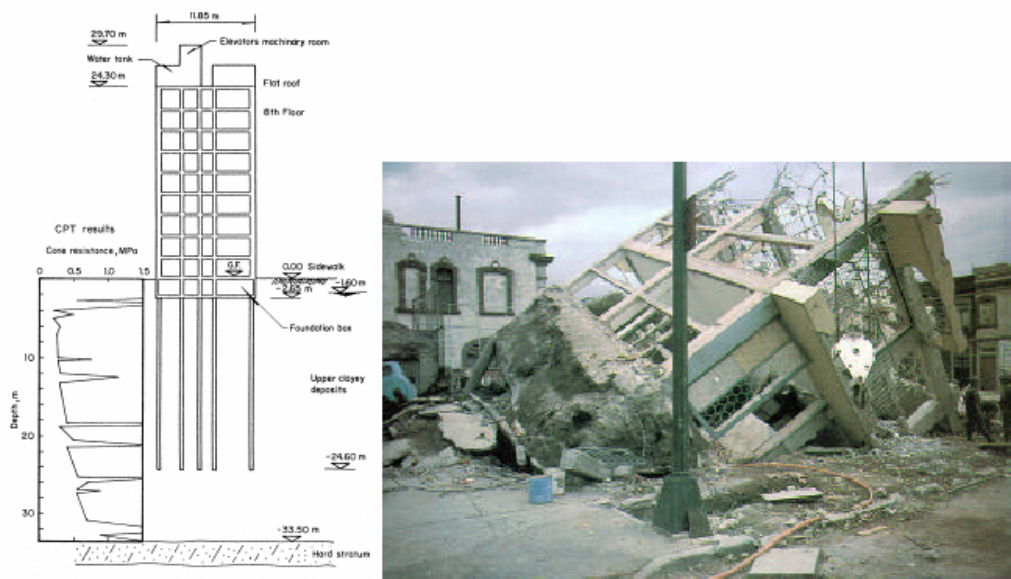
Ten story pile supported building founded on soft soils during the 1985 Mexico City Earthquake; Left: Elevation including geotechnical information, Right: Overturned Structure (after Mendoza and Auvinet, 1988)
